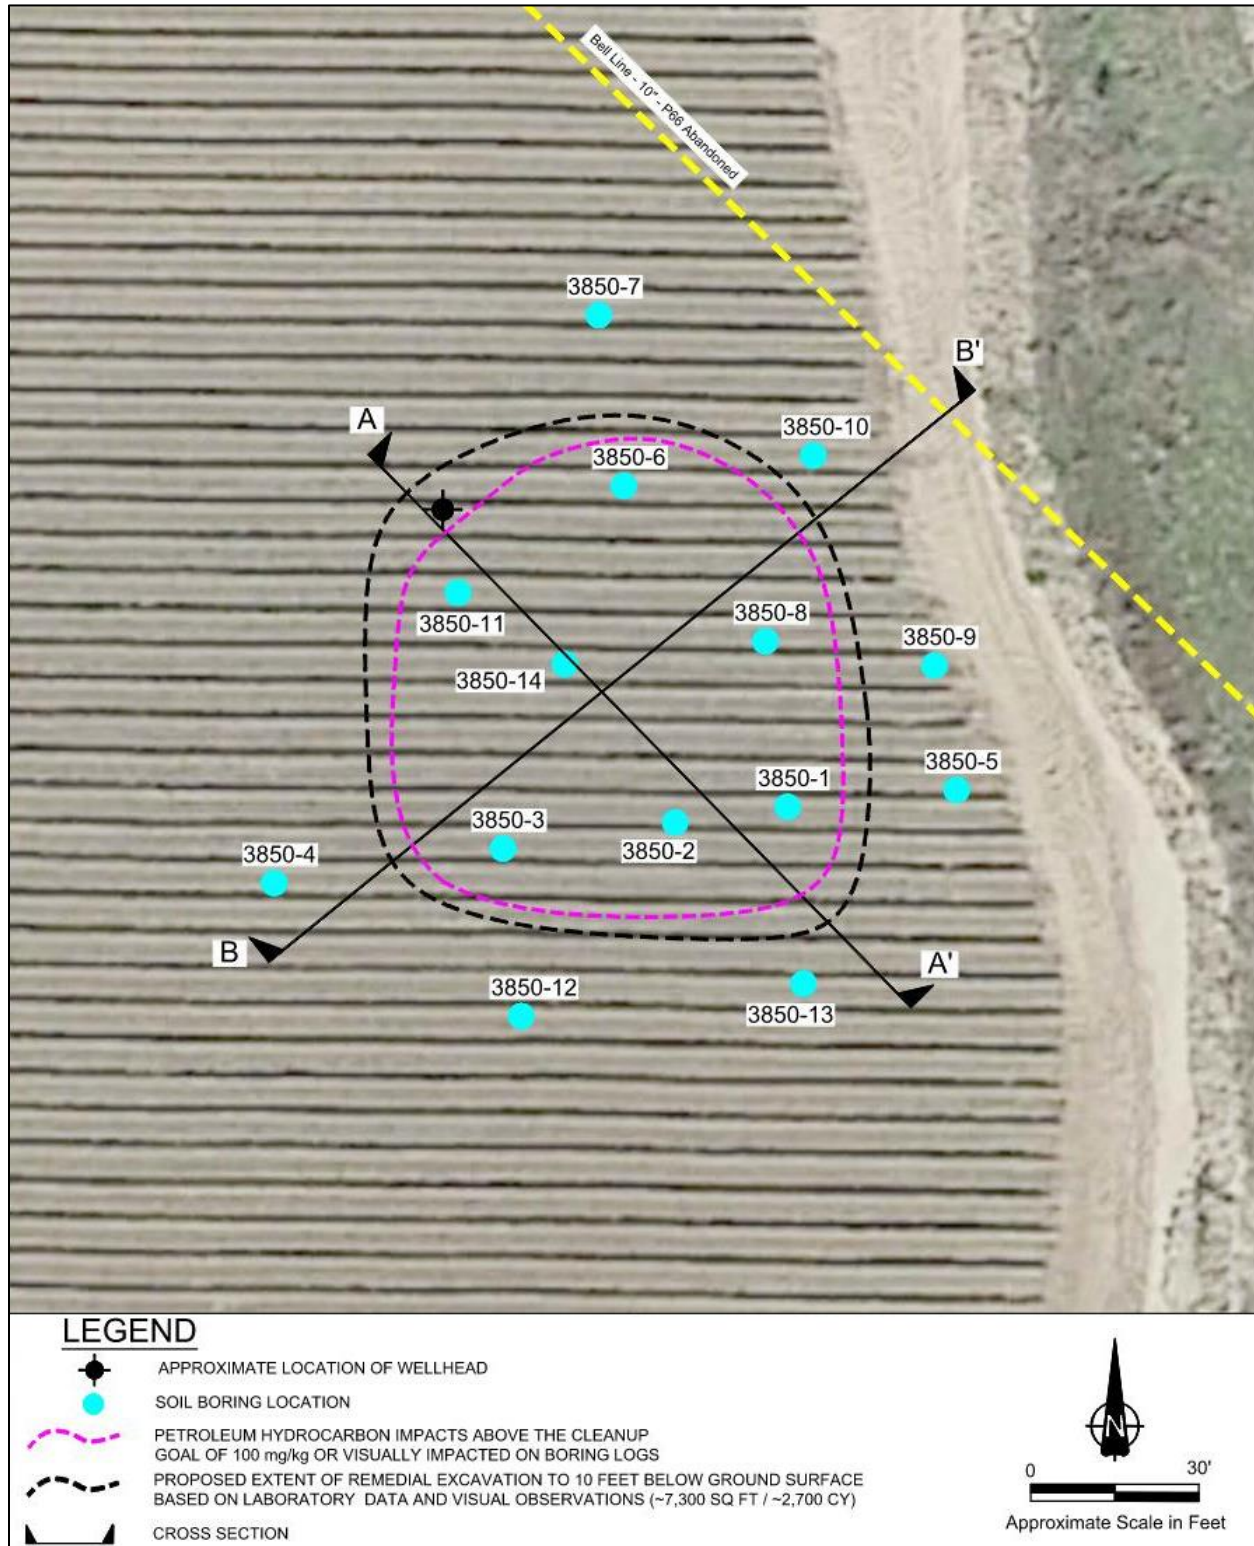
SITE PLAN WITH SOIL BORING LOCATIONS.
